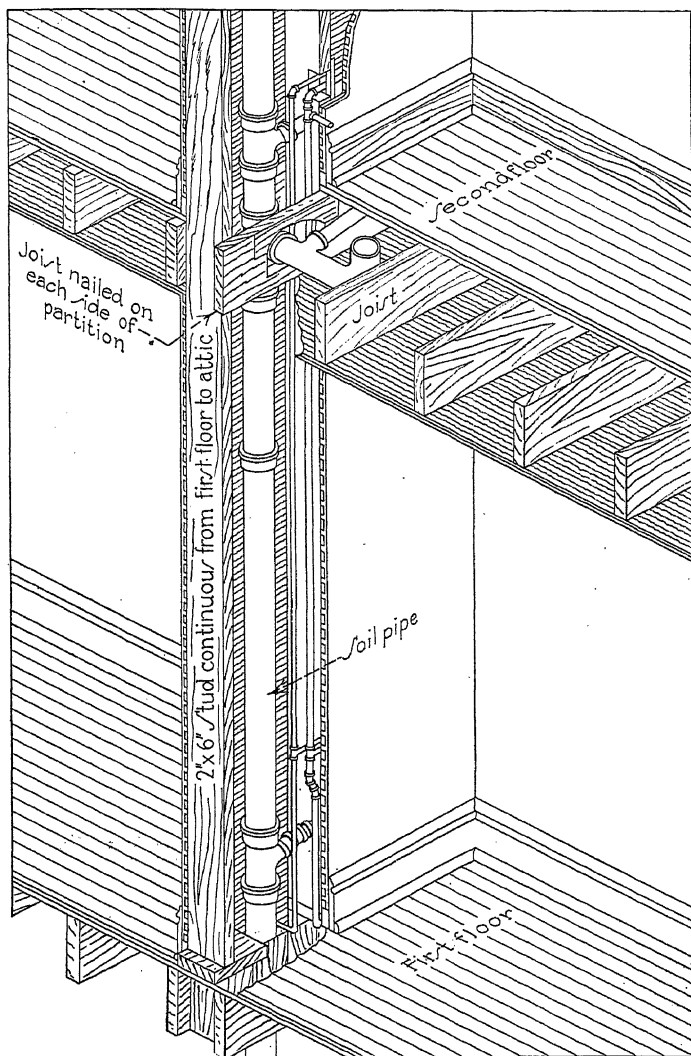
Two by six-inch partition studs accommodate vertical pipes readily and without undue loss of supporting capacity, when notched. Horizontal pipes should be run through the centers of joists, to avoid weakening them and to leave a good nailing surface for the floor. (Courtesy of U. S. Bureau of Standards.)
